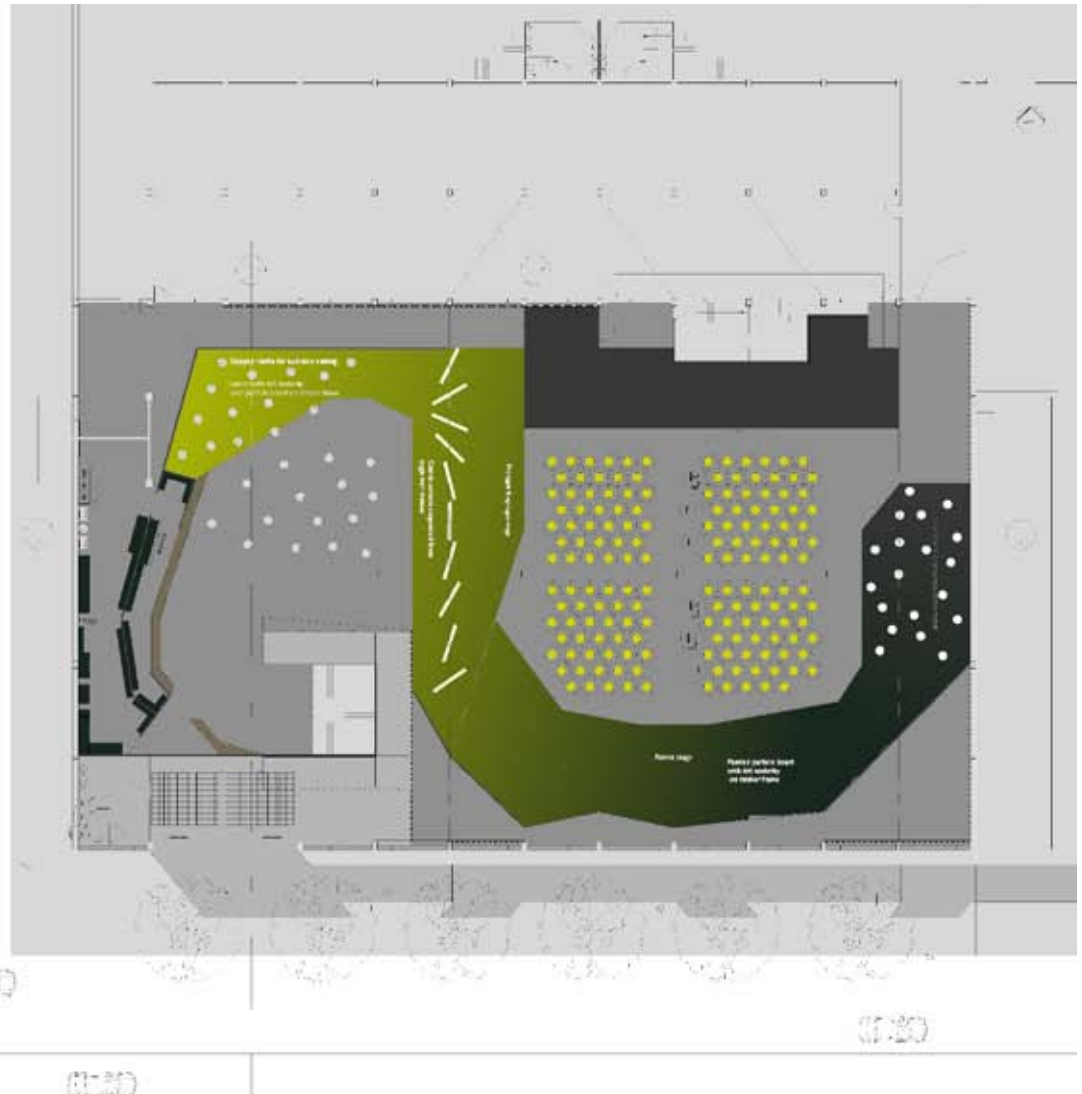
Floor plan of Temporary Theatre 1:500 (Author, 2010)
